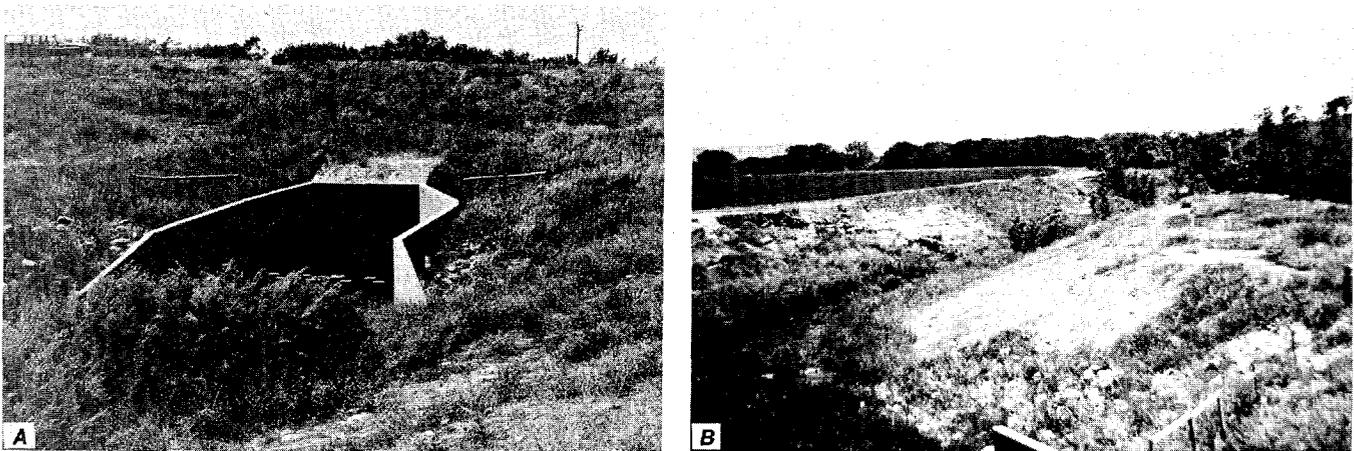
One Mile Creek at site 72. A, Culvert and stilling basin at downstream side of roadway embankment. B, View downstream from bridge along relocated channel of One Mile Creek, in 1979.
